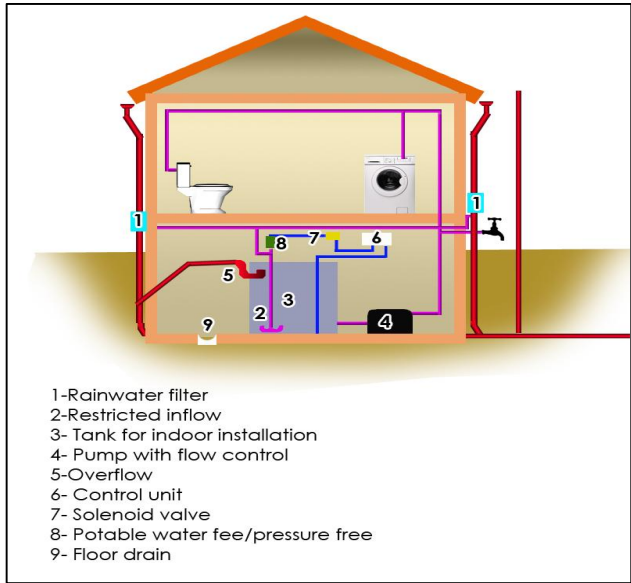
Typical Storage Tank and Pump Installed in the Basement.
